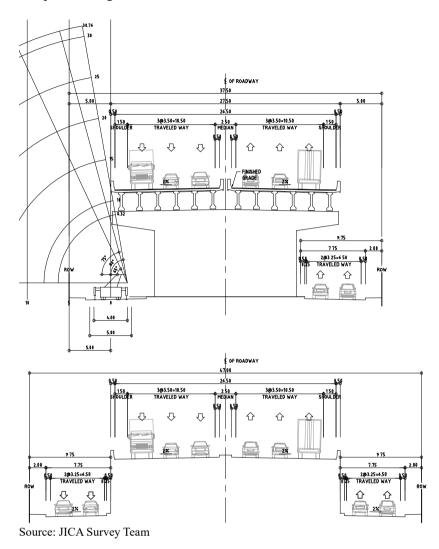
Typical Cross Section of Beginning Section of Mandaue Coastal Road
